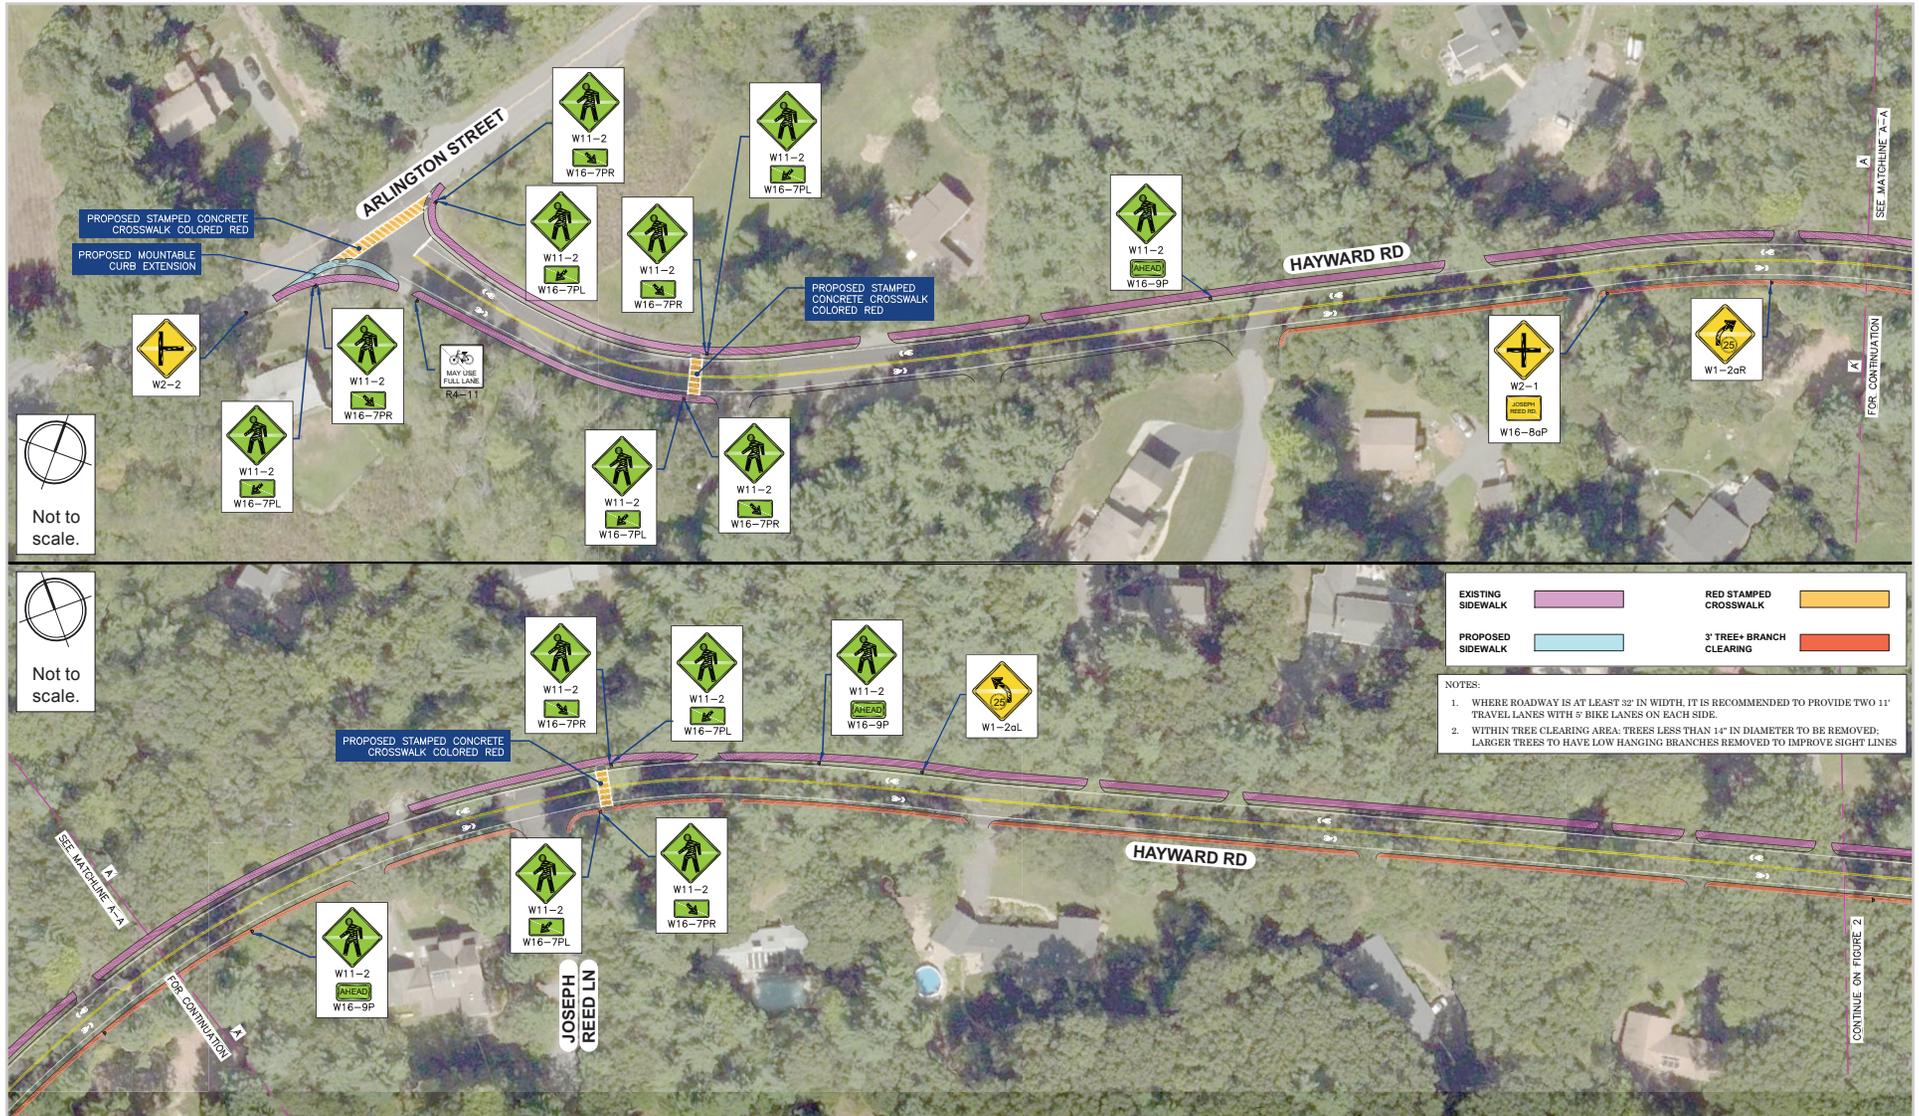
Short-term Improvements – Route 2 Bridge to Main Street
